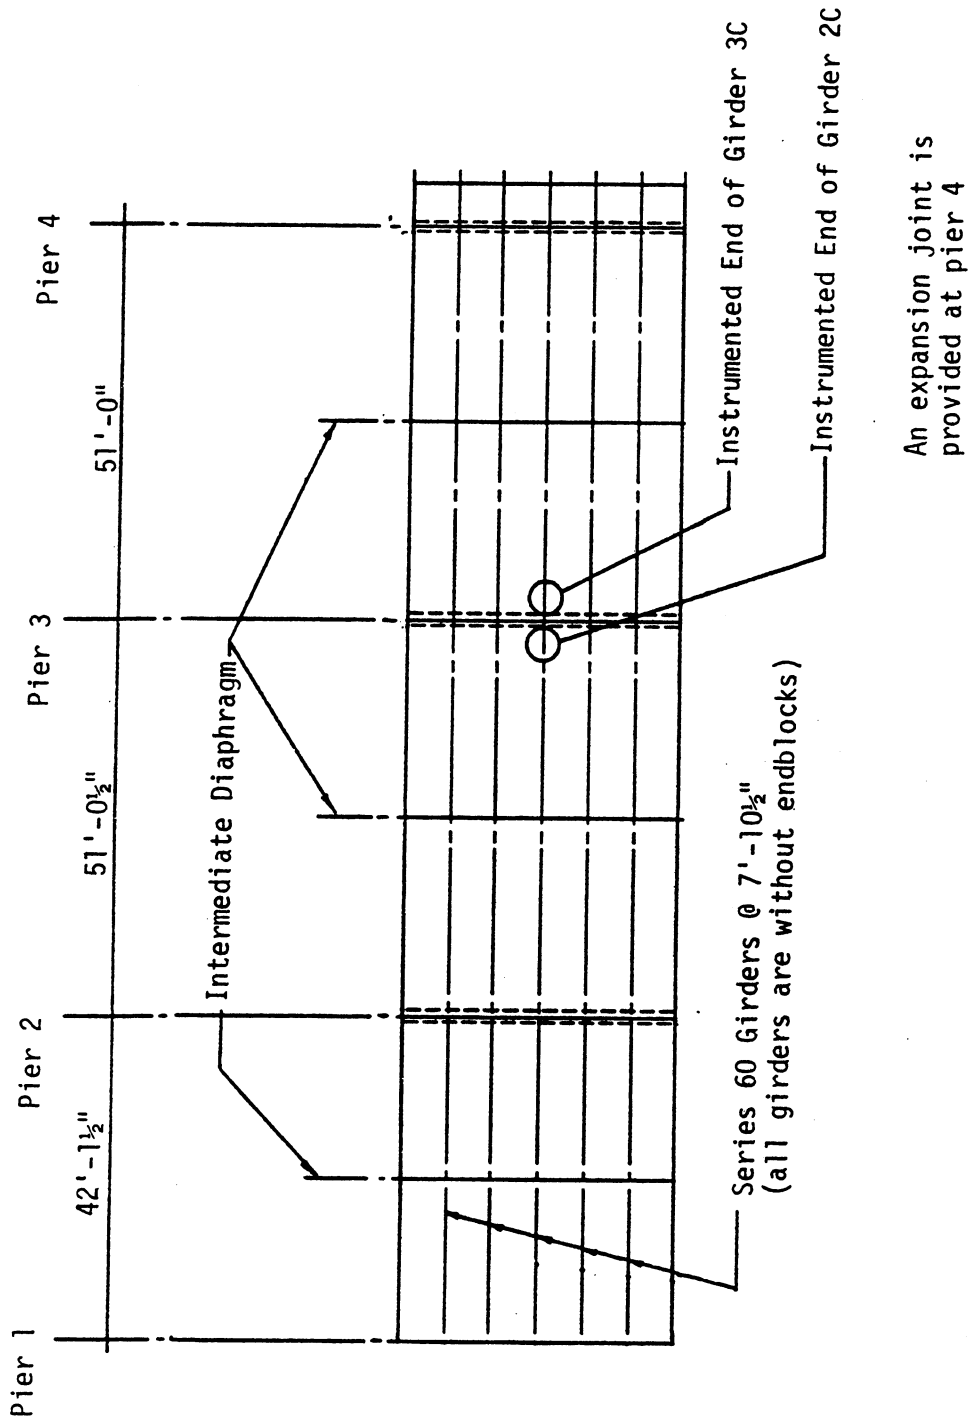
a Field Test - Framing Plan for Spans 1, 2, and 3
